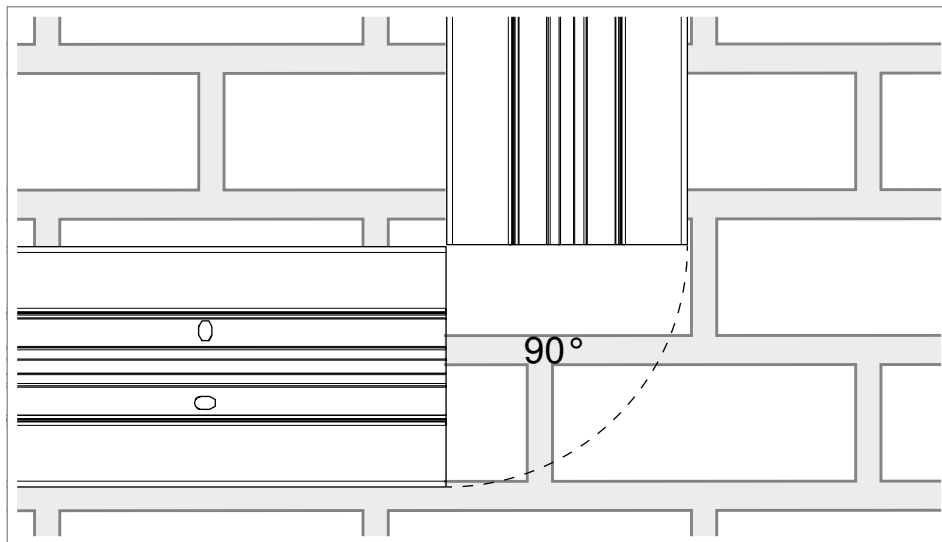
Mounting the device installation trunking Rapid 45-2®
